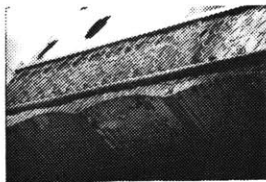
Jack-Arch construction in traditional house. Baghdad, 1930s - 40s
